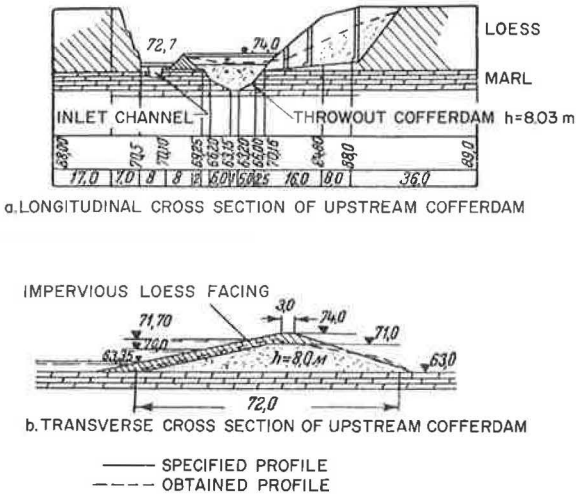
Longitudinal and transverse cross sections of upstream cofferdam during construction of Government Electric Station No. 1 Dam, showing pre-shot and post-shot profiles.
